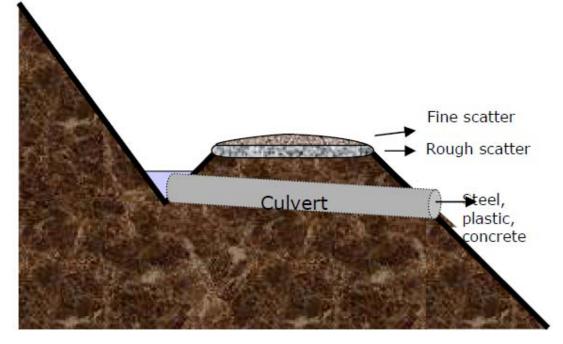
Details of culvert under passing the forest road (Stampfer, 2005)
